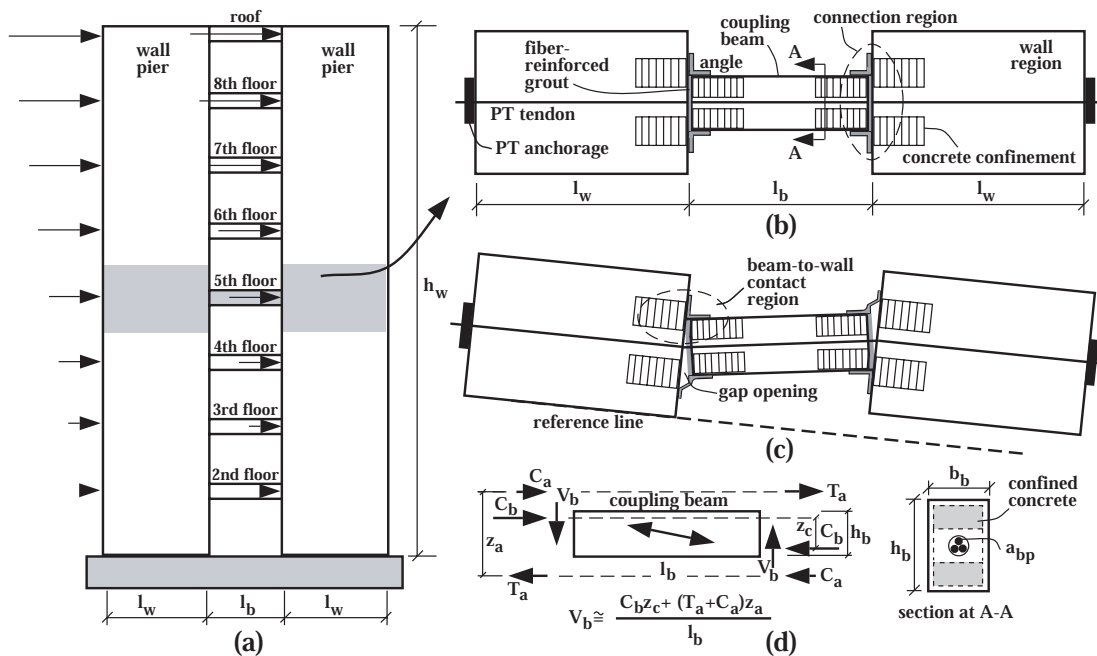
Coupled wall system: (a) multi-story structure; (b) floor-level subassembly; (c) idealized exaggerated displaced shape; and (d) coupling forces.
